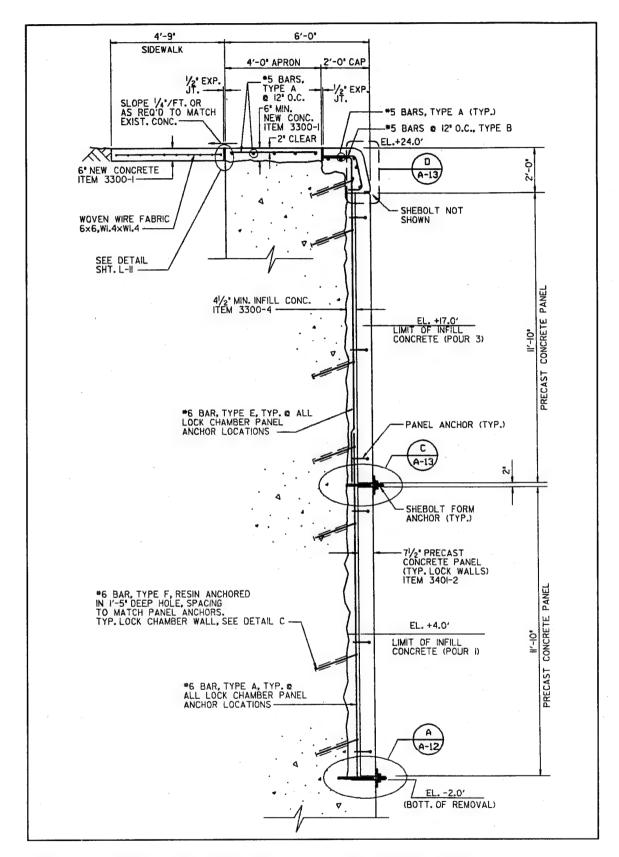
Typical land wall repair section, Troy Lock (from Miles 1993)
